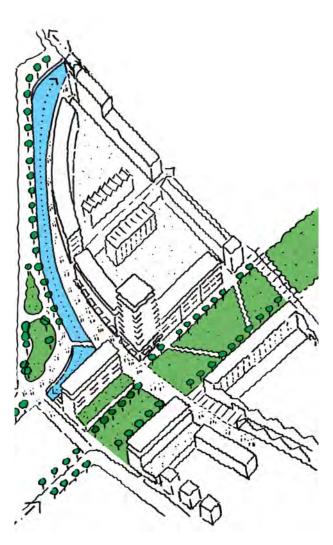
3D illustration showing how the tallest element within the masterplan marks the heart of the site where the blue and green network converge.
